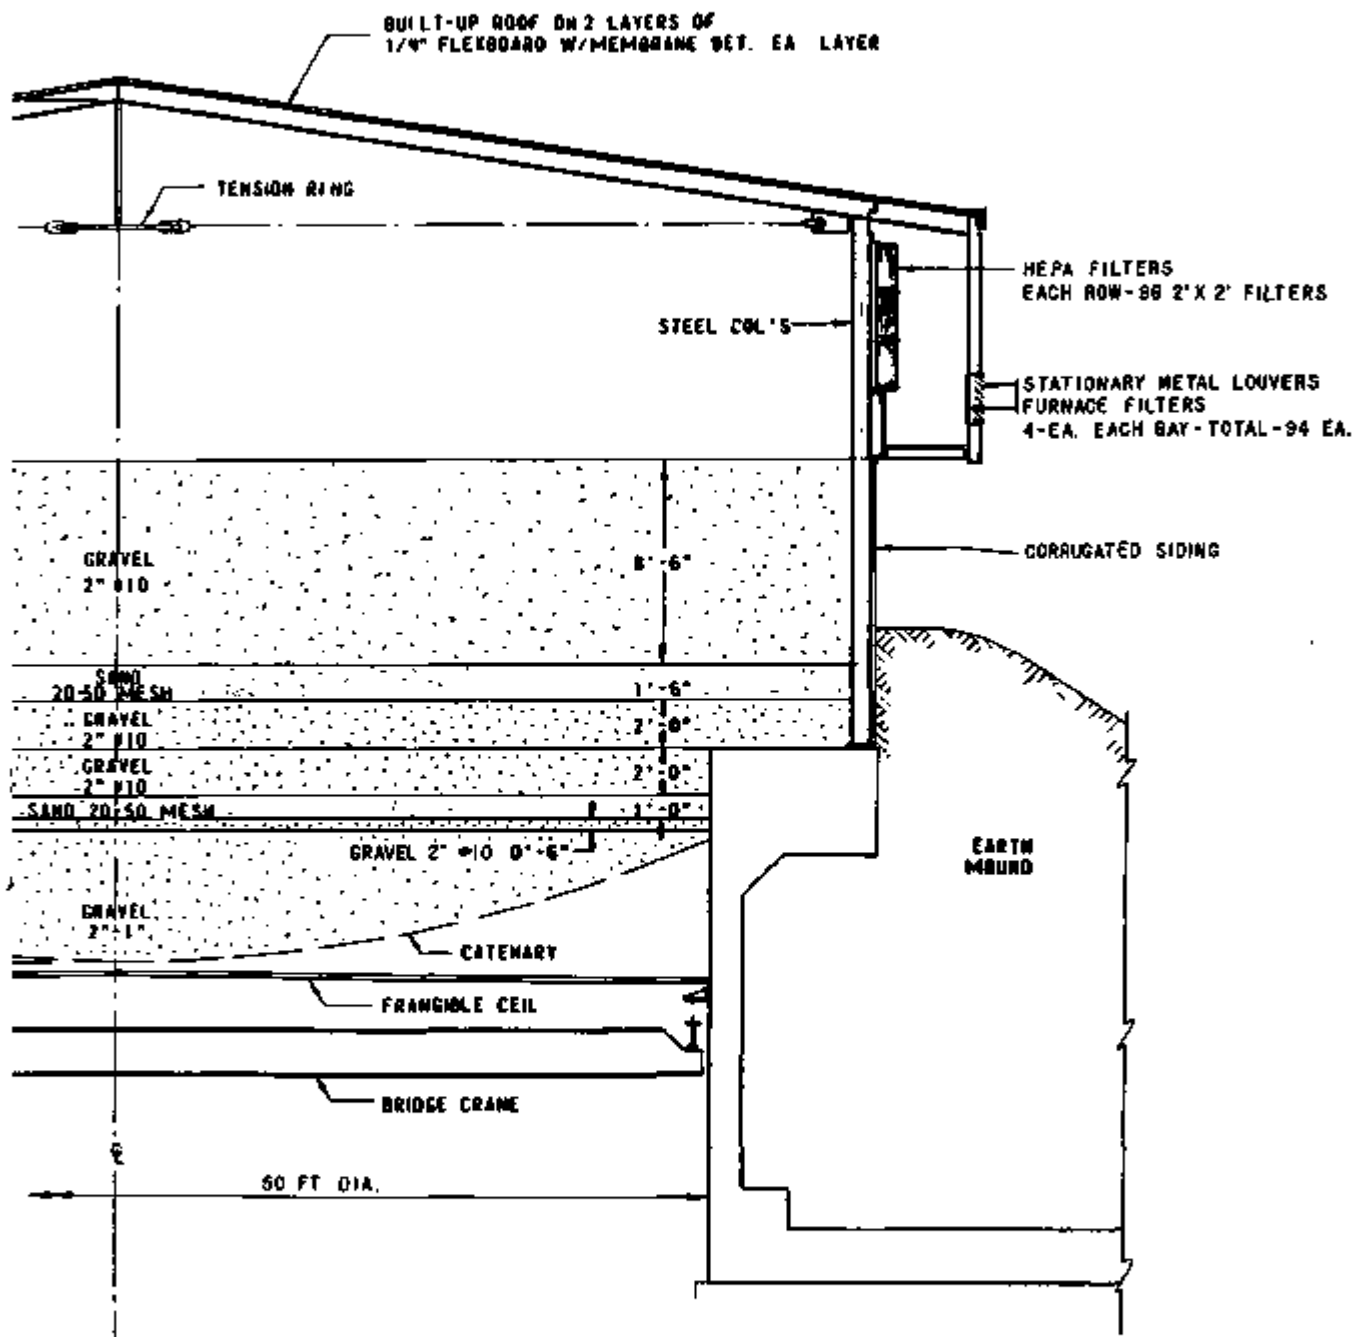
ZPPR Roof Cross Section. ANL-ID-108-A11898.
